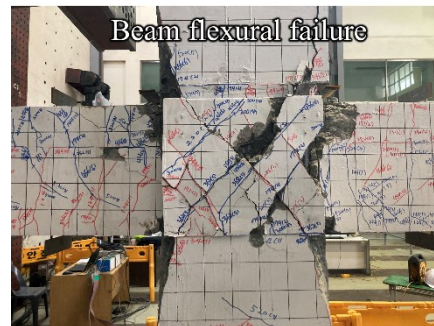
shows failure pictures after the tests ended. In all specimens, plastic hinges were formed at the beams and concrete spalling and crushing were detected. After the maximum load, J-N1 suffered bond damage of beam bottom longitudinal bars rather than joint damage. Both J-G1 and J-G2 suffered cracking damage on the joint and concrete crushing on beam top region at the joint face, and J-G2 suffered severe damage on the joint than that of J-G1.
